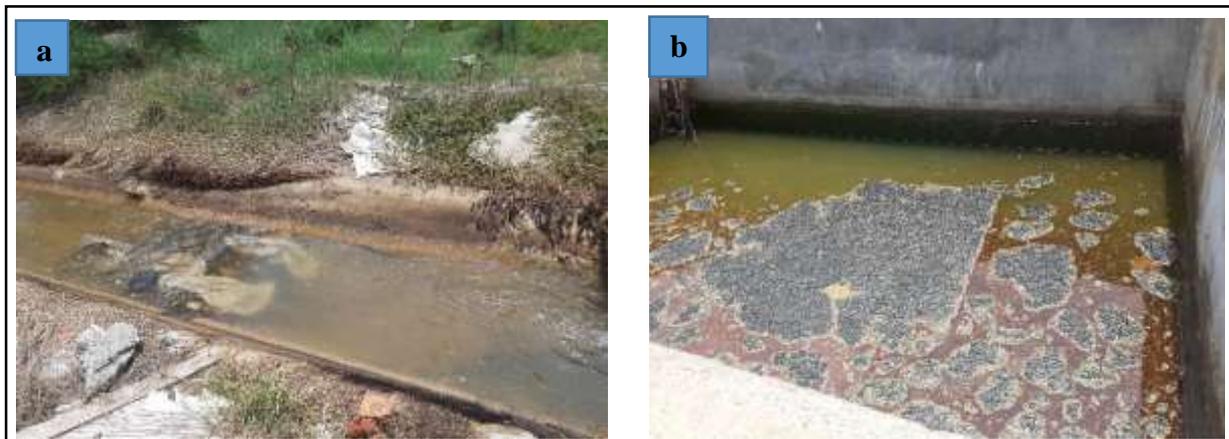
a) Gutter carrying runoff b) concrete tank holding surface runoff
